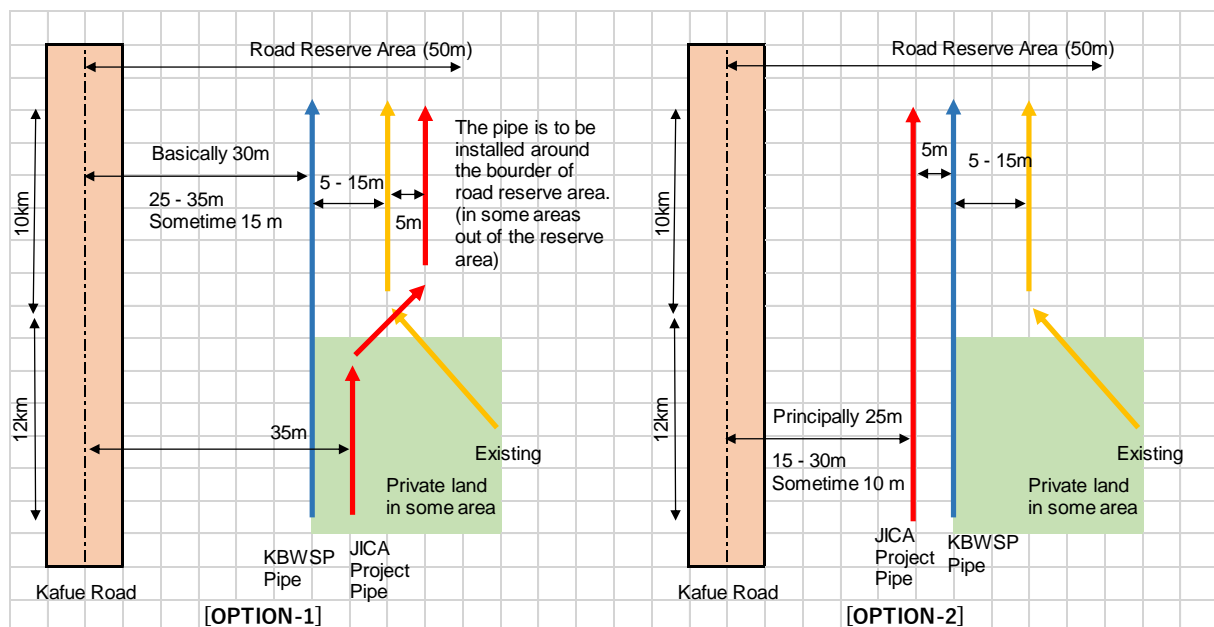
Original Plan of Transmission Pipiline Routes and Impact by KBWSP
